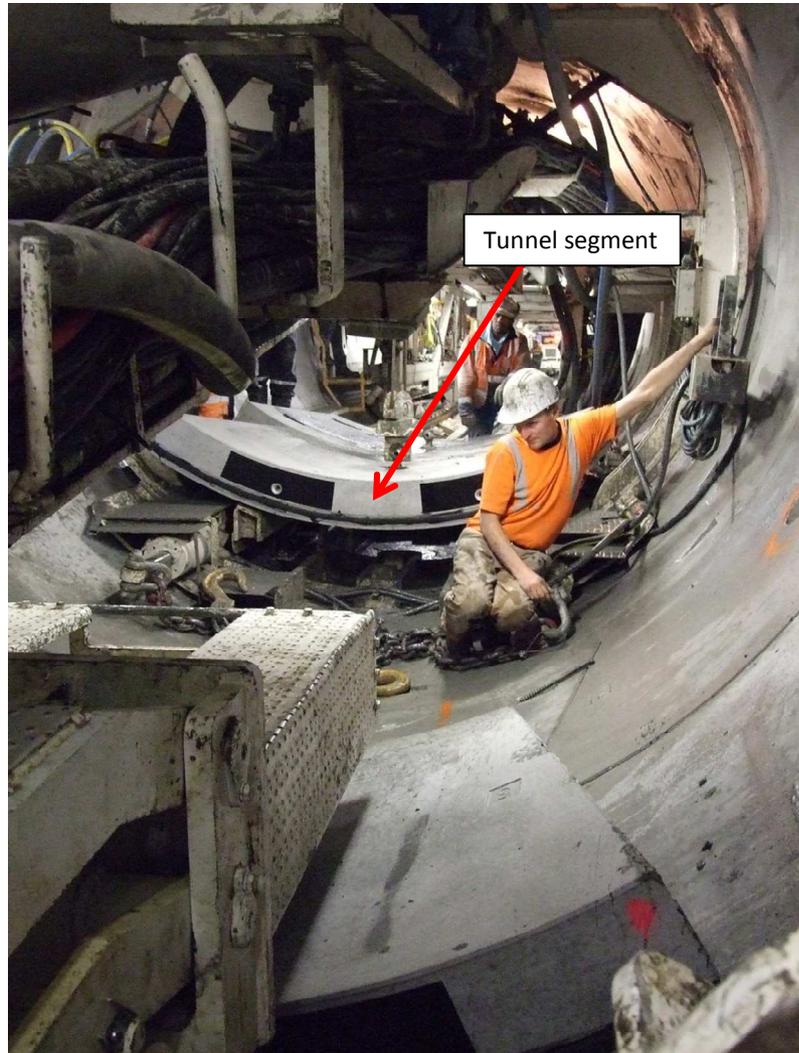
Precast liner segments being installed on Watercare's Hobson tunnel.
